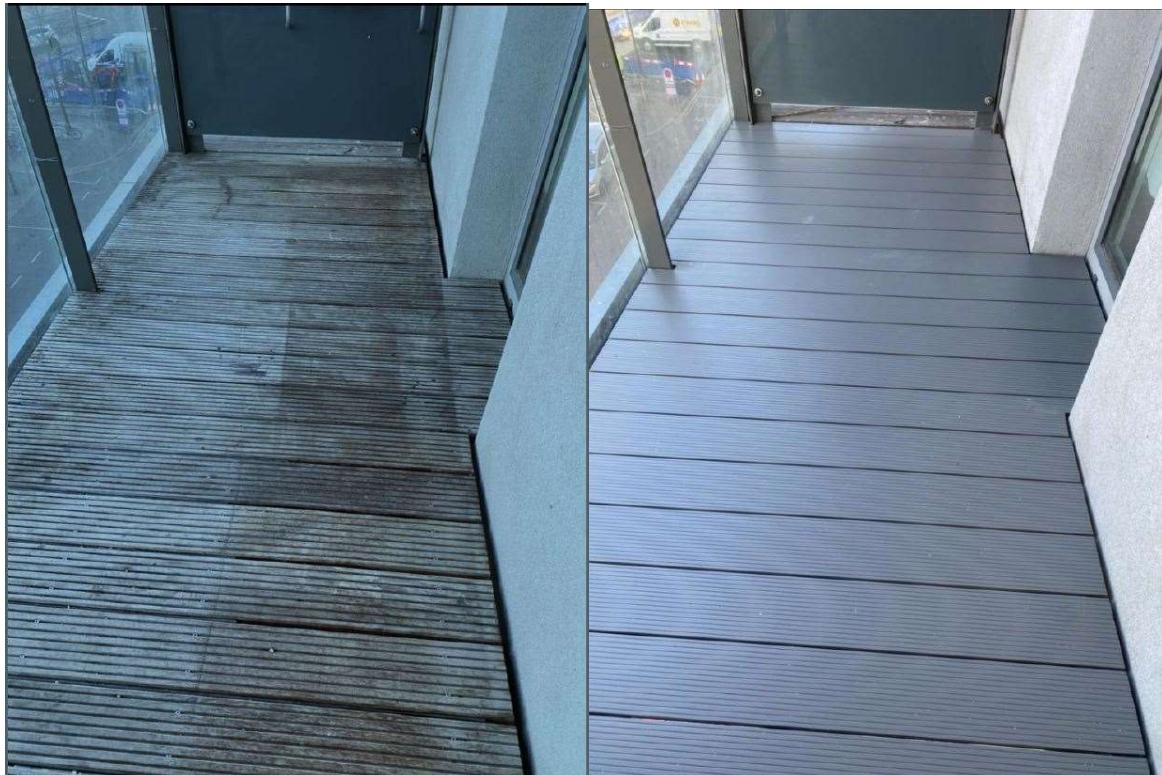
First Example of a completed balcony decking replacement; the left-hand side photo shows the original timber decking balcony, the right-hand side photo shows the same balcony and the completed aluminium decking replacement.
